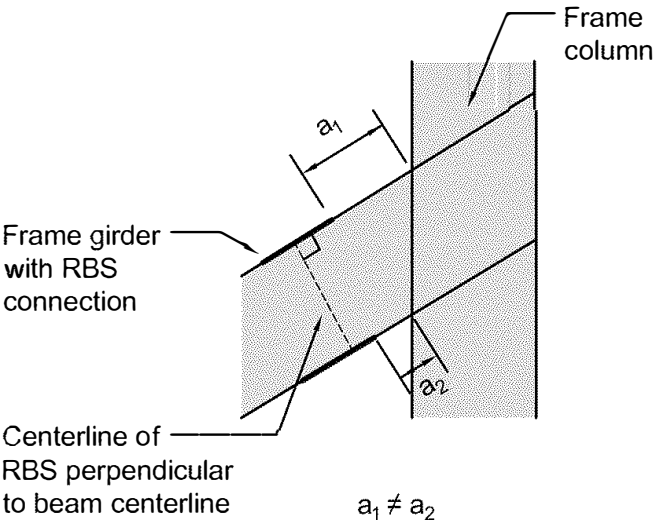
Analytical studies (Kim et al., 2010) suggest that sloped frame beam with RBS centerline perpendicular to beam flanges perform better than if RBS centerline is parallel to column centerline.
